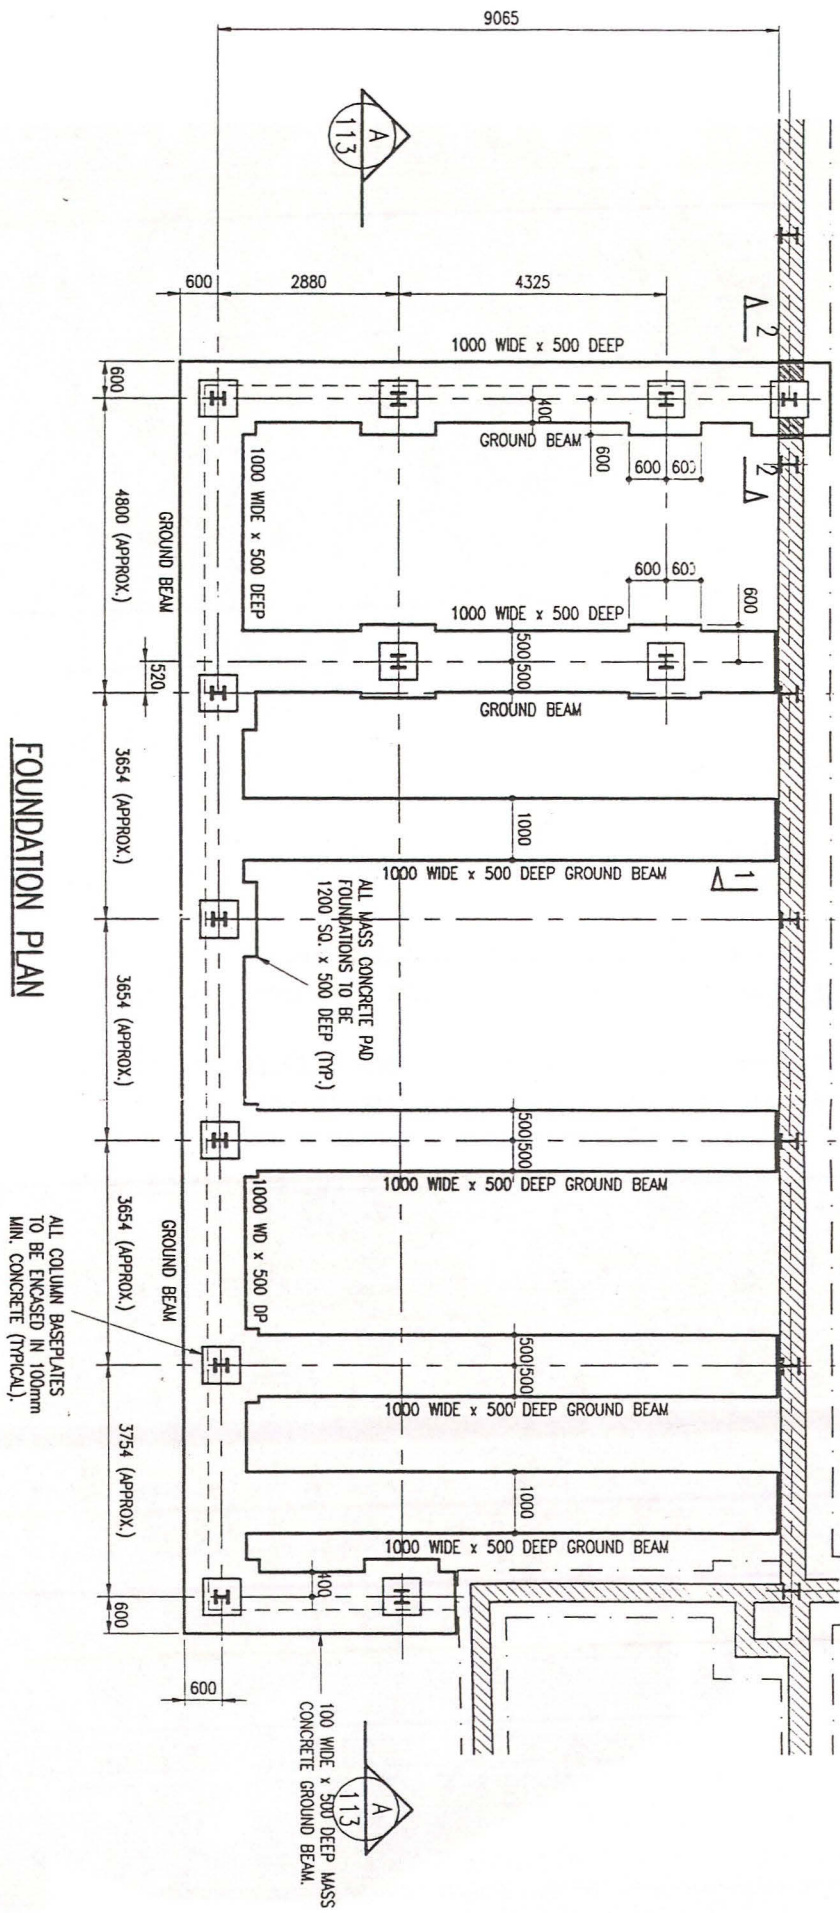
Foundation plan of the proposed extension (reproduced at reduced scale from NBDA dwg. no. 1617-S-111. © NBDA Ltd).
